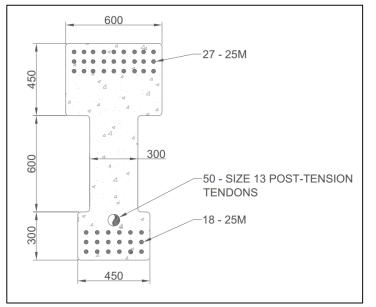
Initial Sizing of Precast Concrete I-beam (Alloy Consulting Ltd., 2015)
